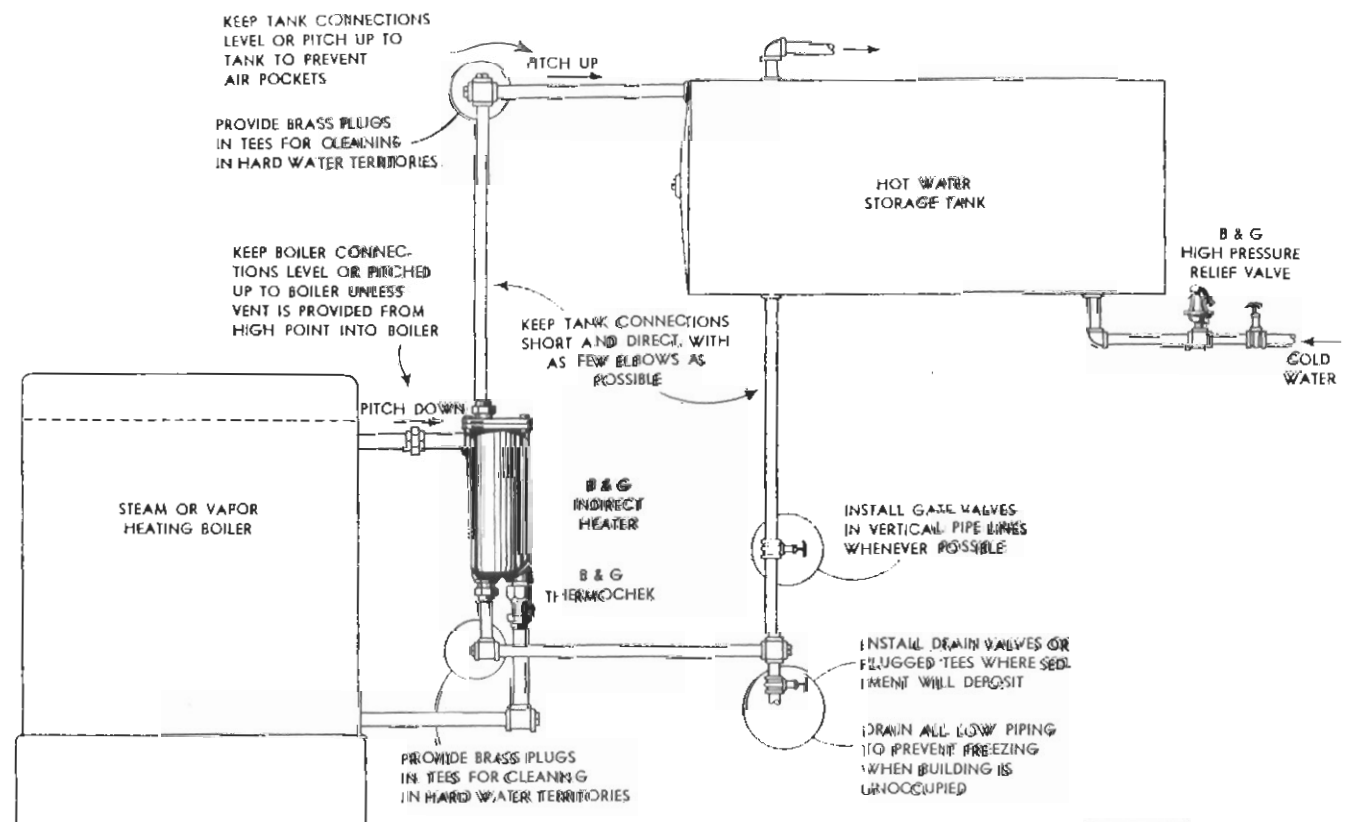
Illustration shows an installation properly equipped with valves, plugged tees and crosses, etc., and with pipes pitching in the right direction.
